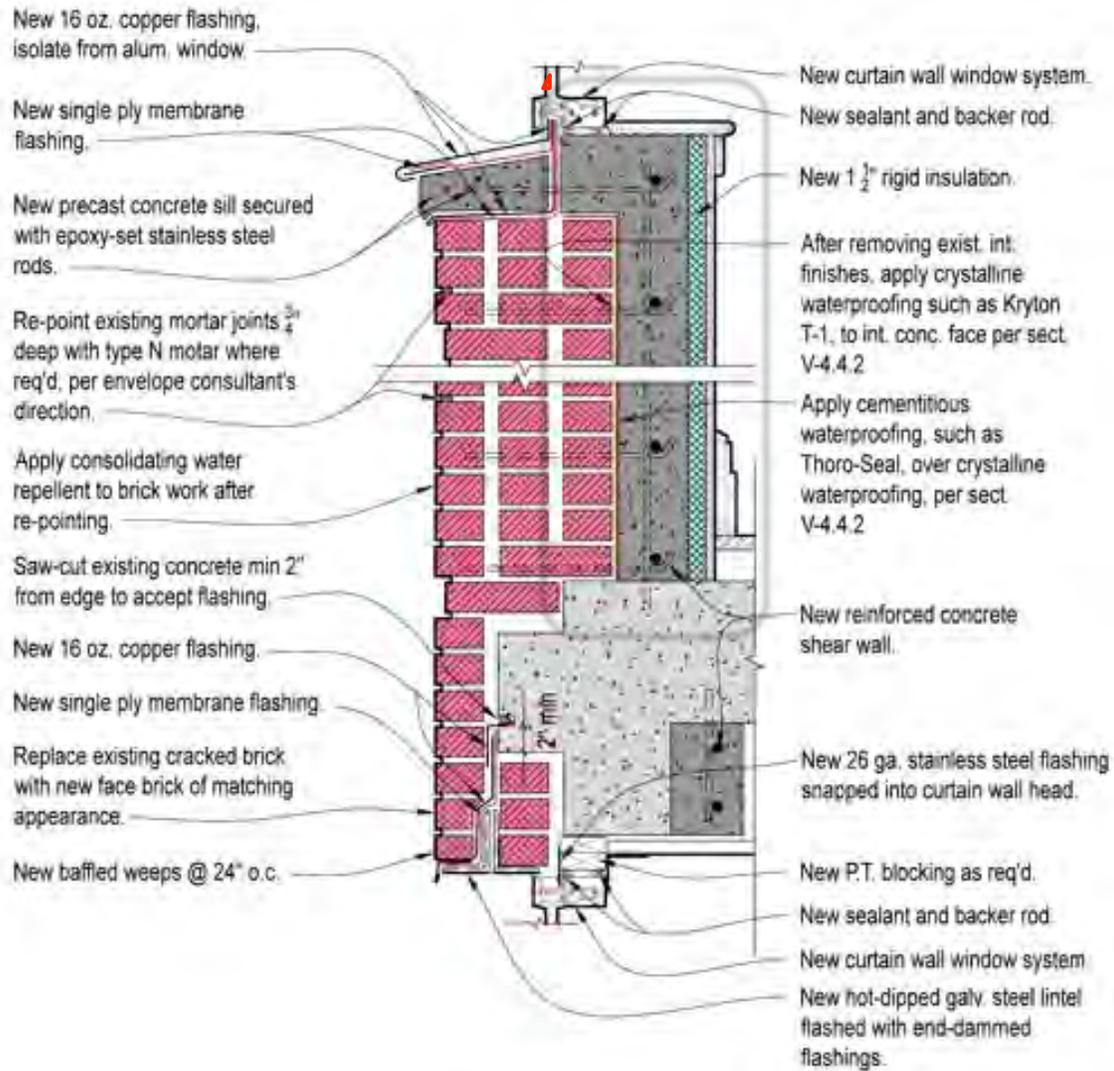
(1): Typical Interior Concrete Shear Wall
